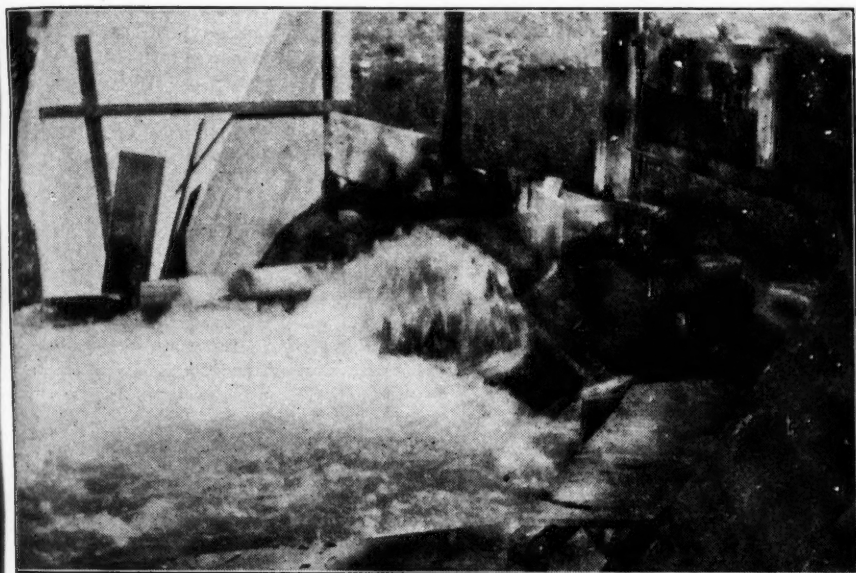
PIT NO. 4 TEST DAM: EXPERIMENT NO. 38. TWO-LEVEL APRONS WITH BAFFLE-PIERS.
